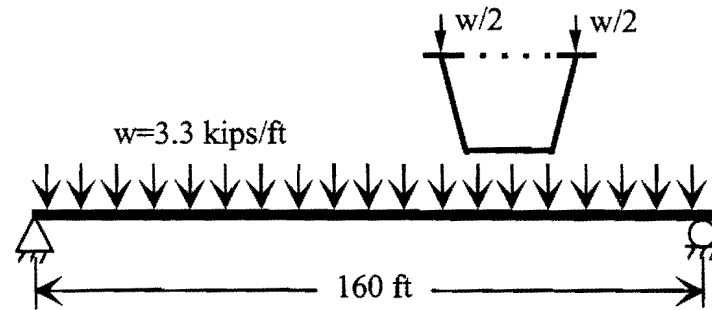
Simply Supported Girder Subjected to Transverse Load
